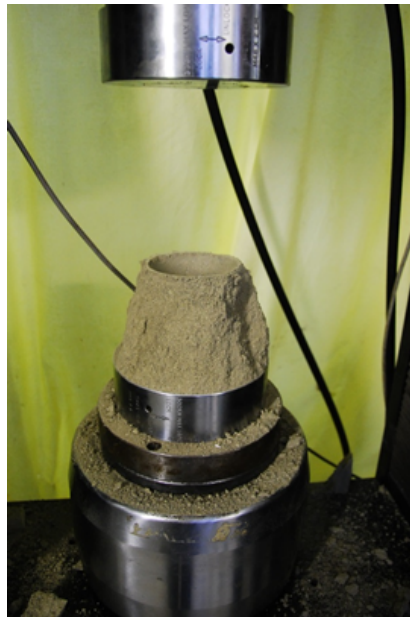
Compression failure of C series with detail of cone shaped crack surface
